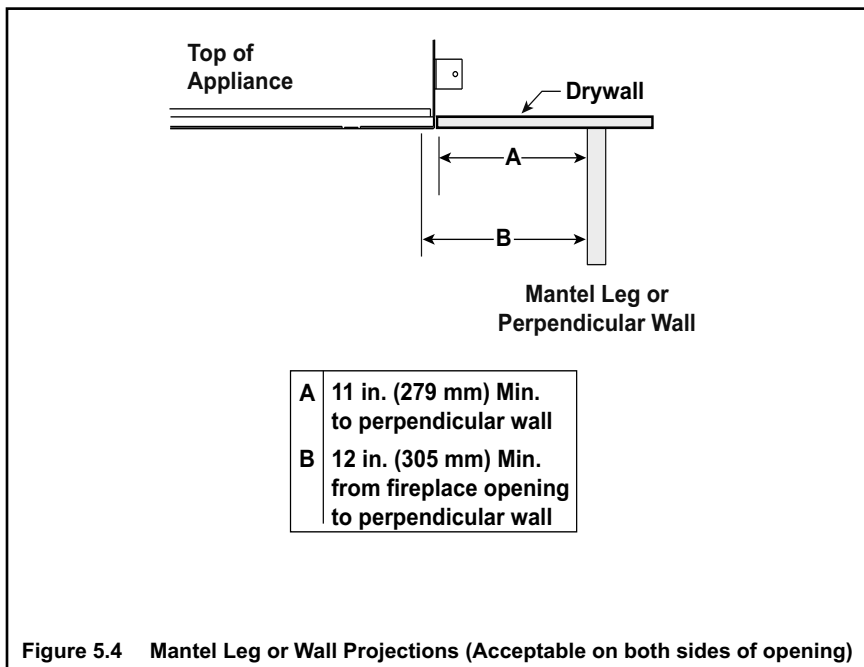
Mantel Leg or Wall Projections (Acceptable on both sides of opening)
